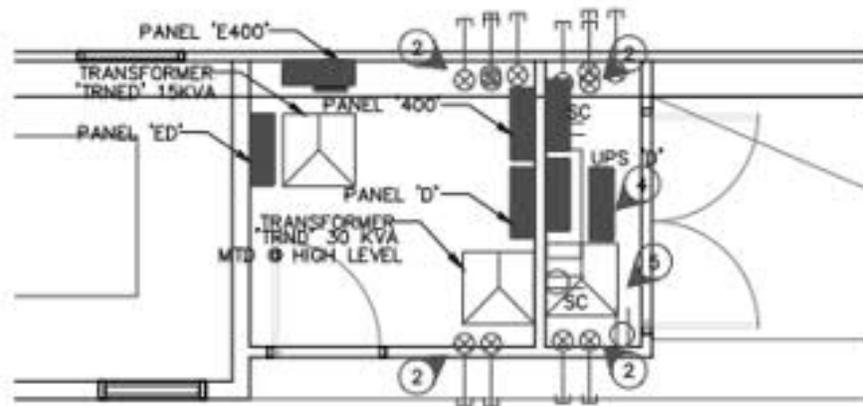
Plan View Layout – Main Floor – Electrical Room #4
